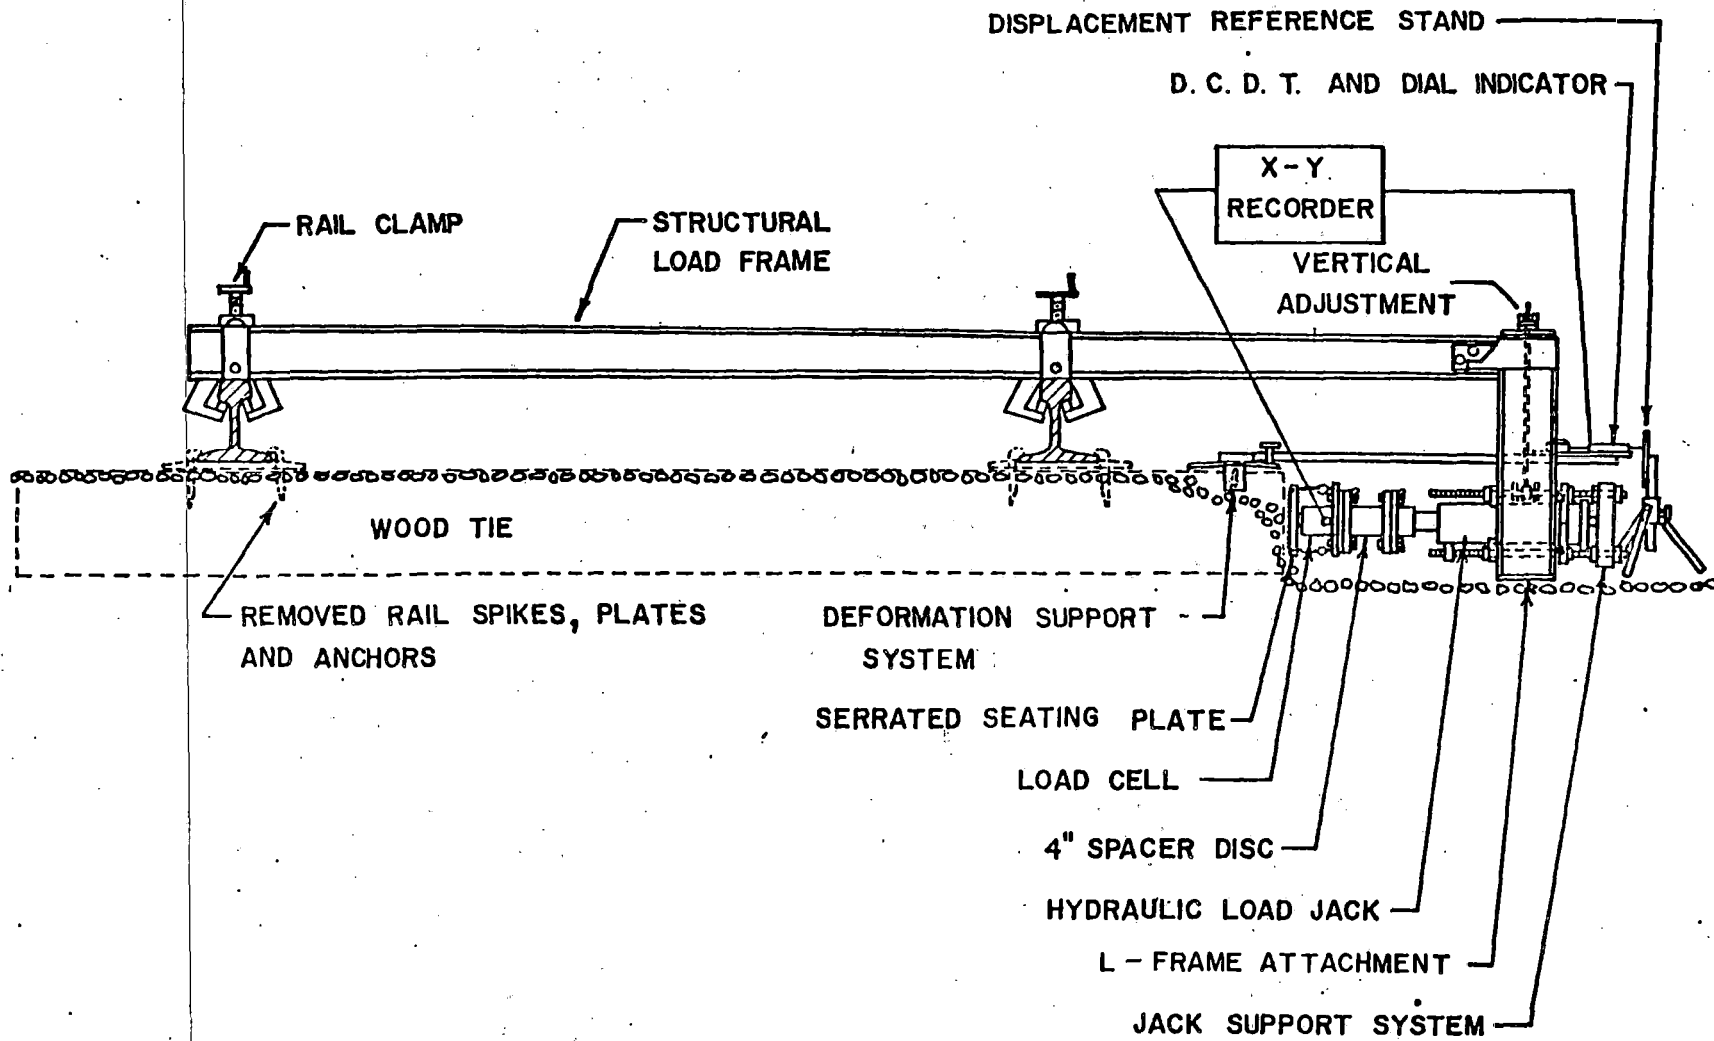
Assembled Lateral Tie Push Test Apparatus (Ref. 1)
